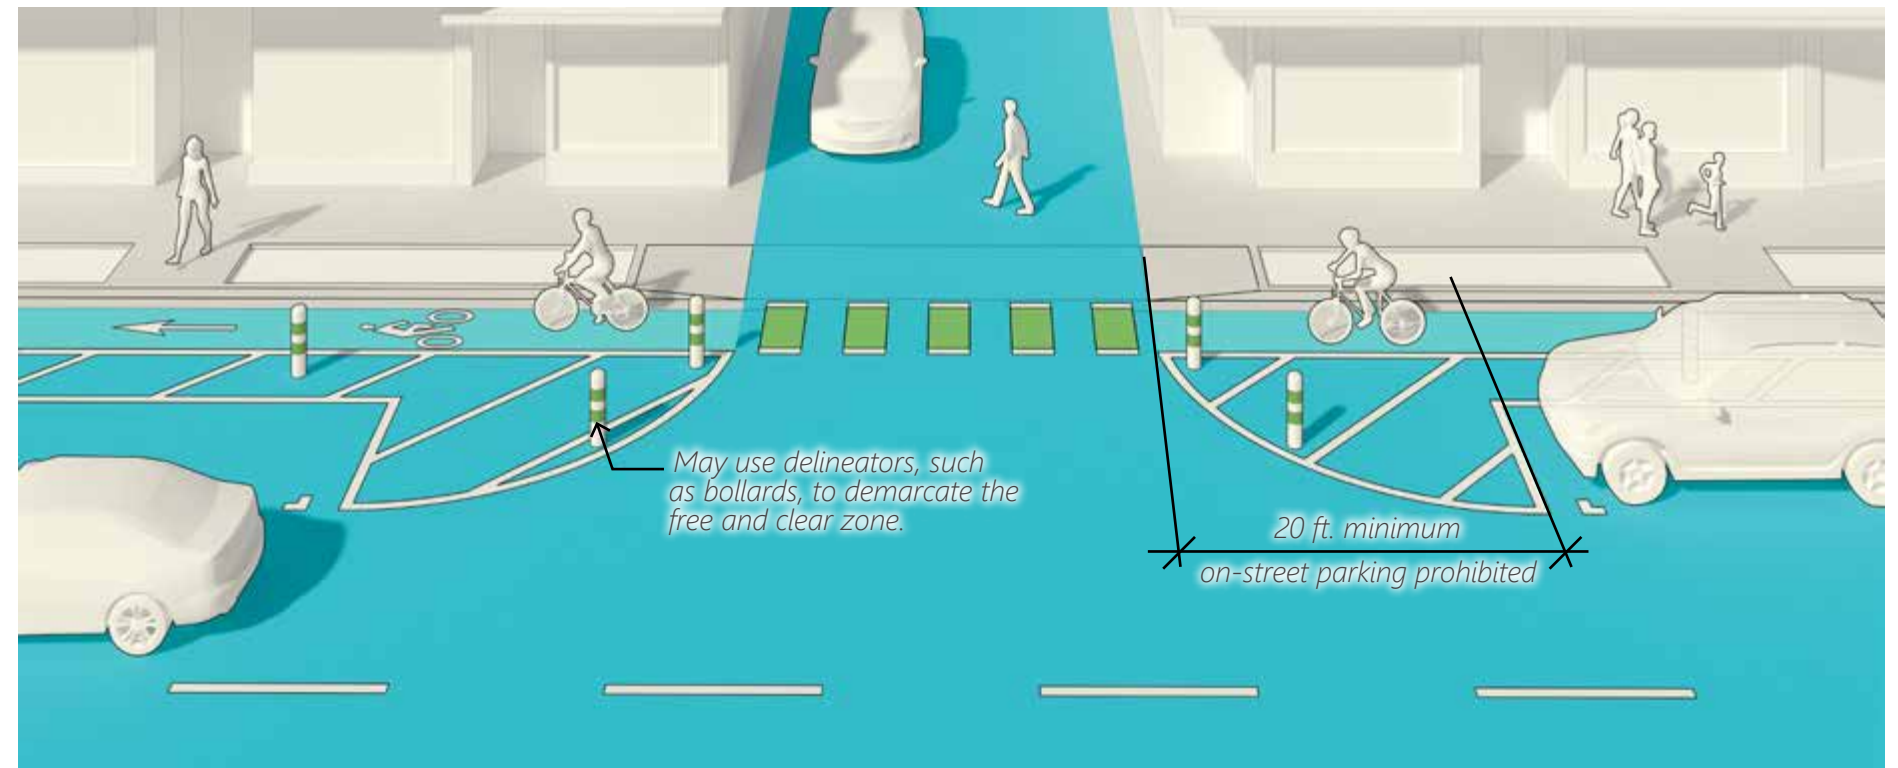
In-Street, Class IV Bikeway, Protected by Bollards and On-Street Parking, at an Alley.
